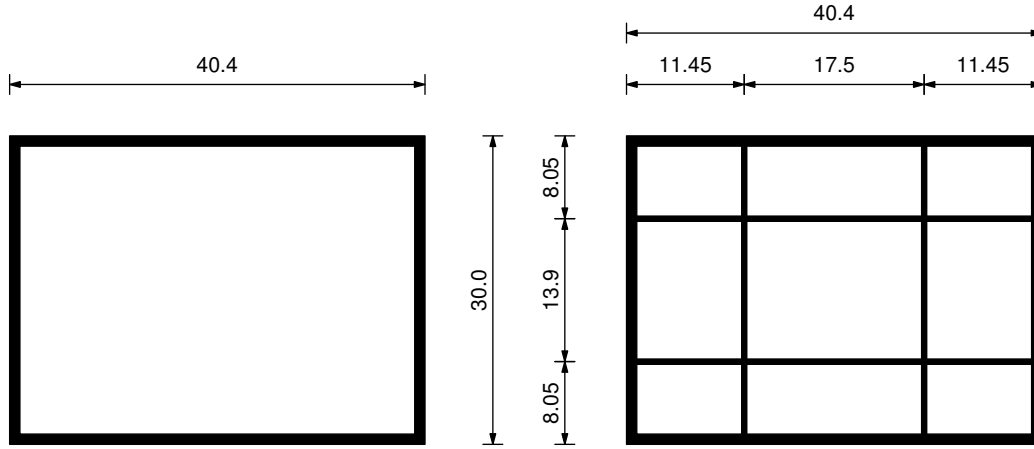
Plans for building with and without inner bearing walls (dimensions in meters).
